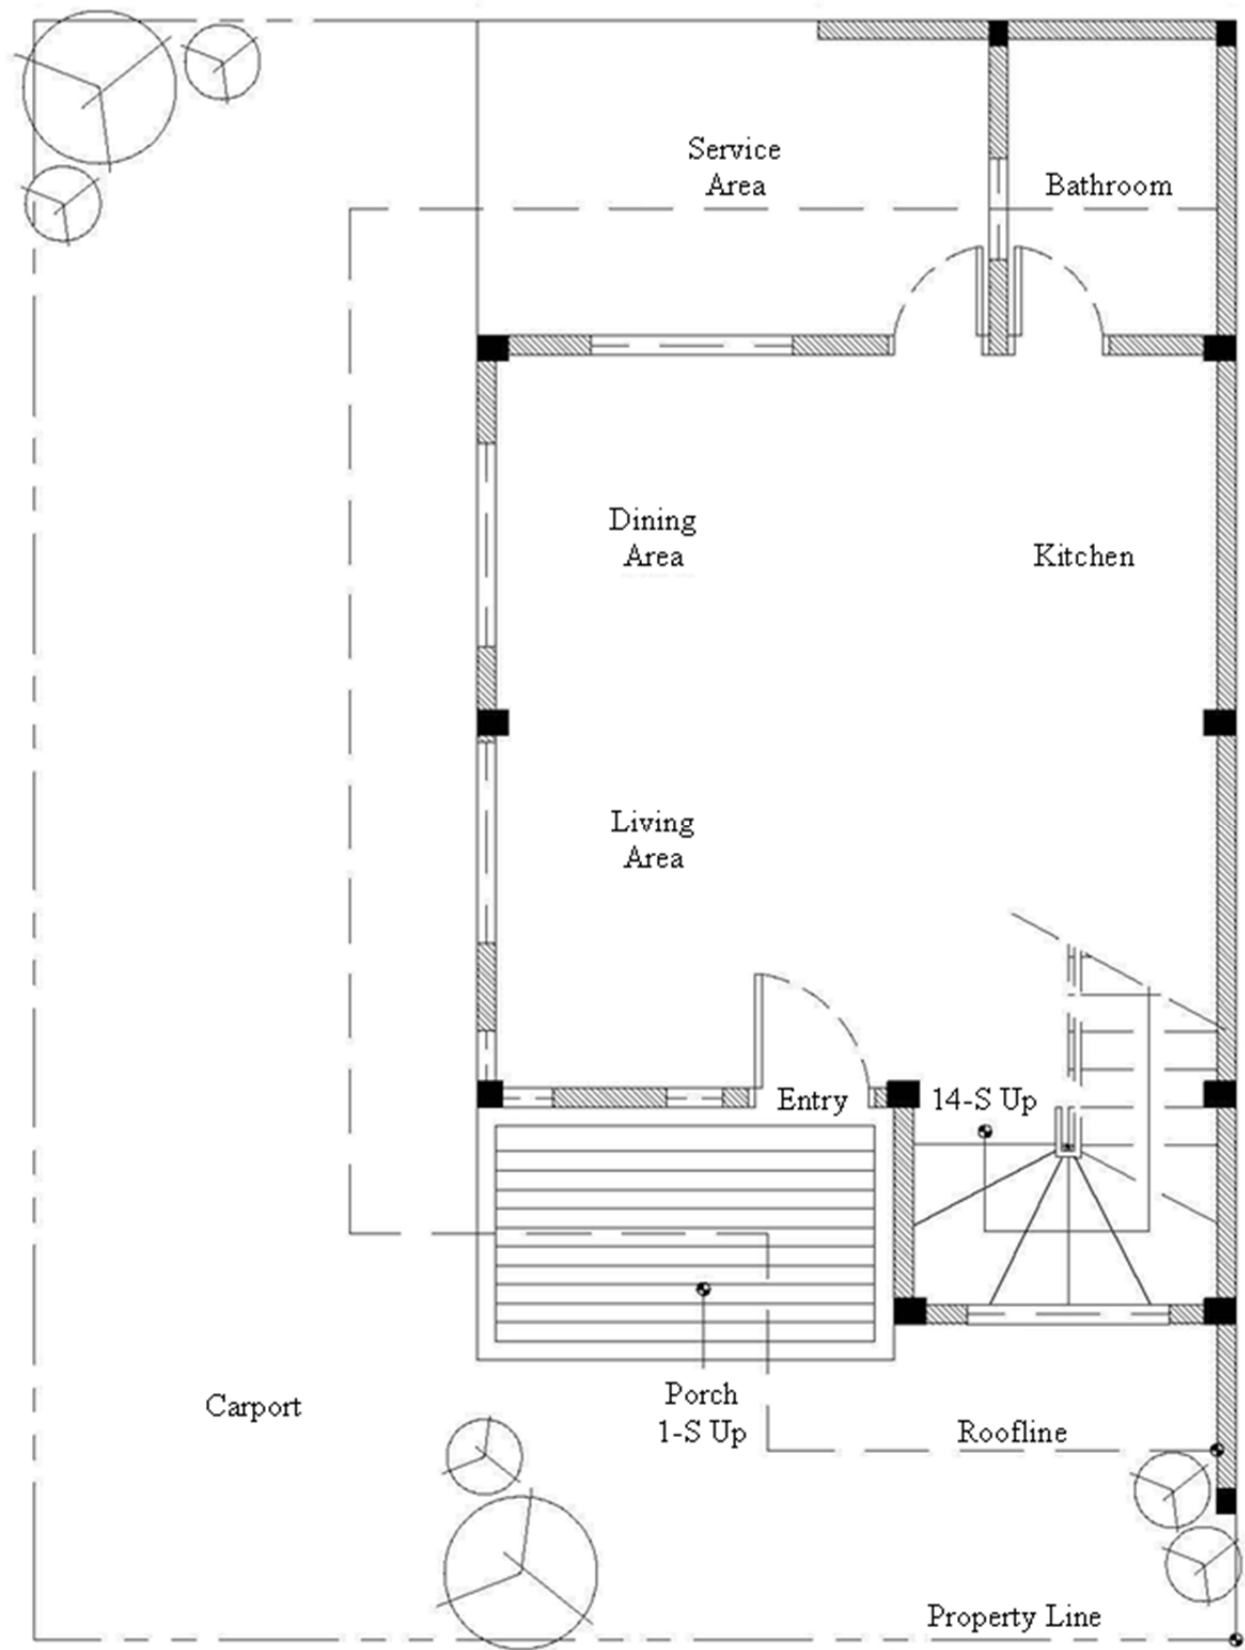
Ground floor plan of model house used to conduct structural check.
